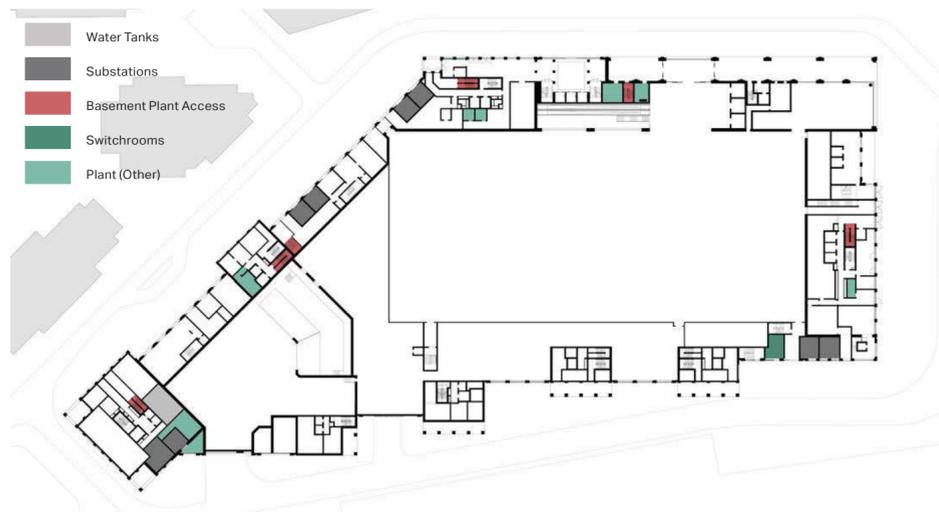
Plot 2 - Ground floor illustrative plant areas
